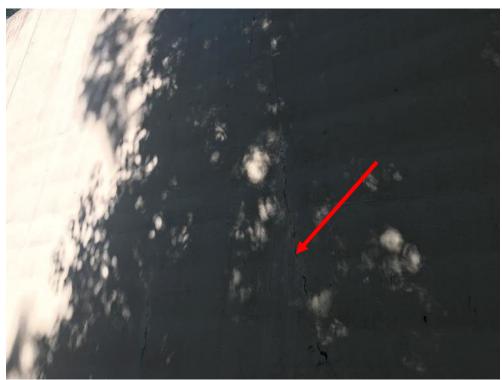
View of canopy at SBR Basin. Note: Corrosion on underside of roof deck.
